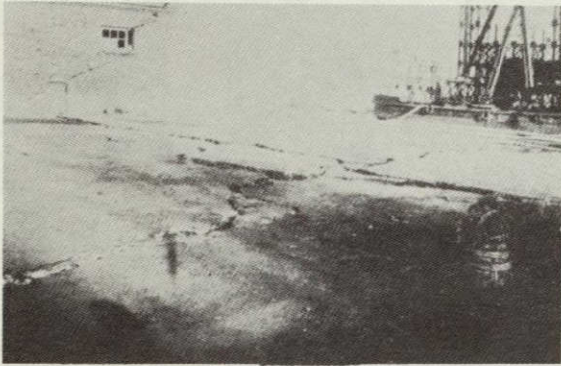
One set of cracks in Tienchuang-Tai paper mill ran 50° northeast, while the other set ran 110° southeast. Width was 5-30cm. The latter crack ran through a warehouse, with the warehouse walls showing jagged cracks. (Mag 7 area)
